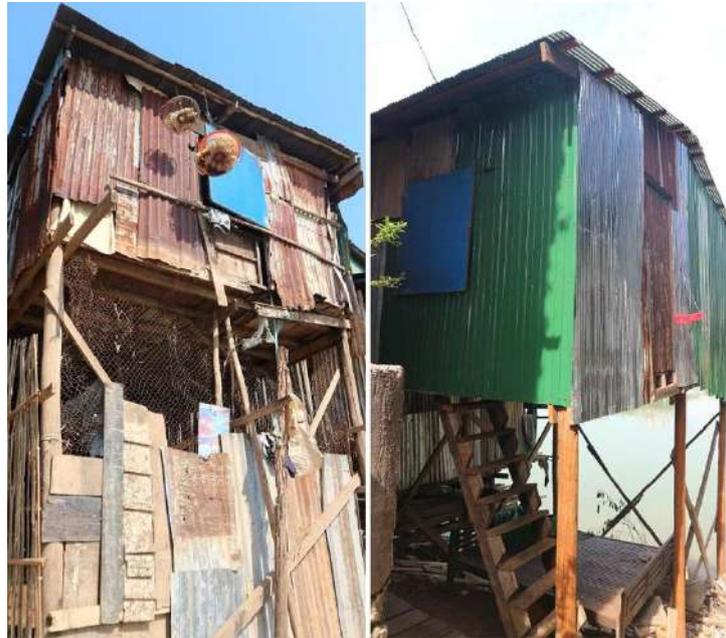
A house before and after renovation thanks to the house renovation kits supported by the PED led project (c) PED
